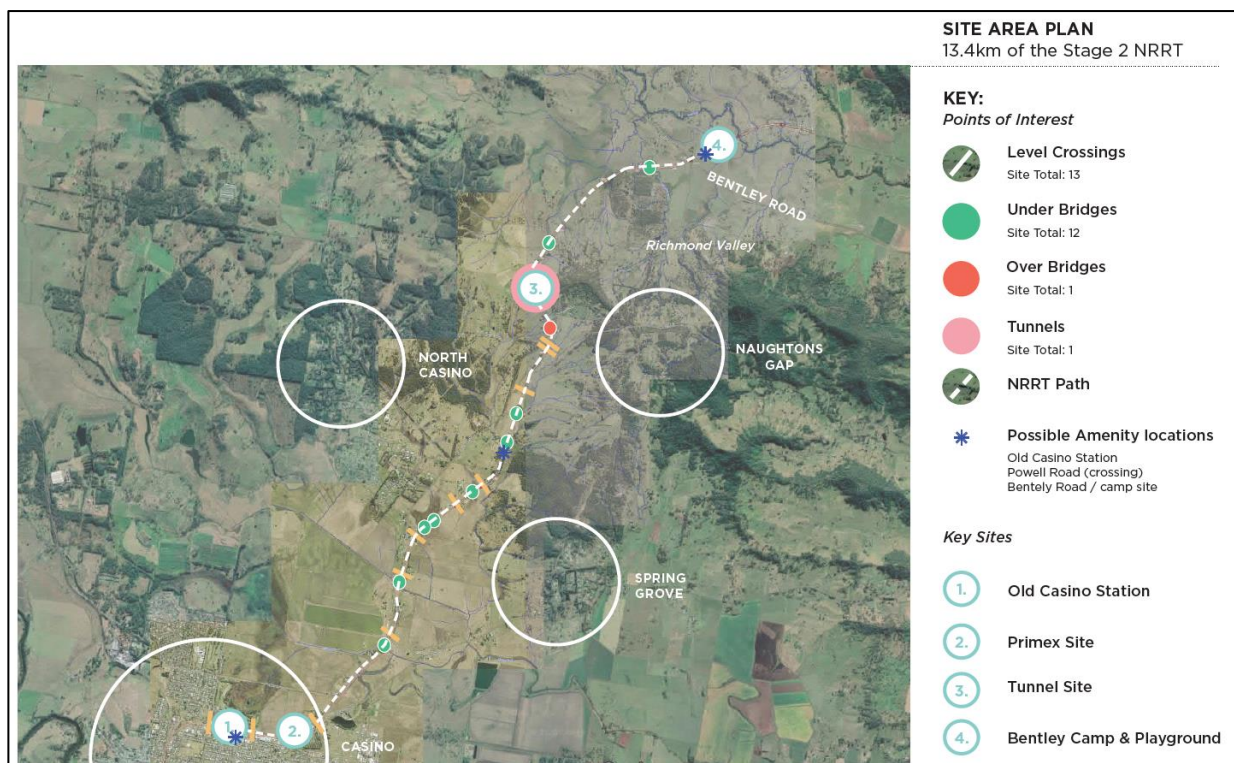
Concept Alignment (Source: Planit Consulting NRRT Masterplan 2020)
